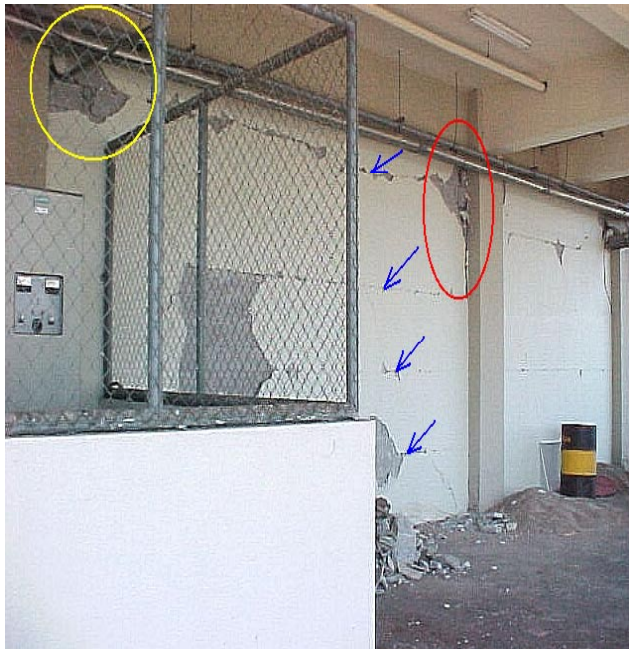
Lateral and diagonal cracks appeared on some infill walls
